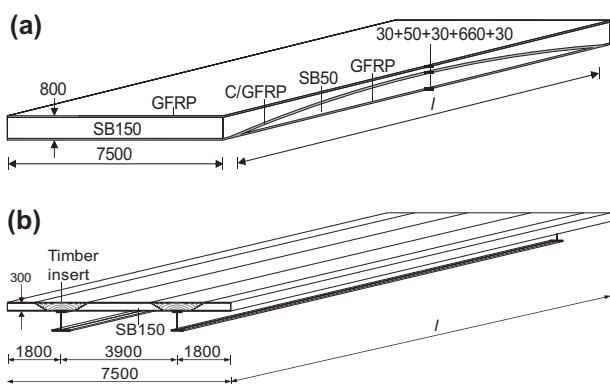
Sandwich bridge concepts for (a) S-C/S-G slabs and (b) D-TI deck on steel girders (dimensions in mm).
